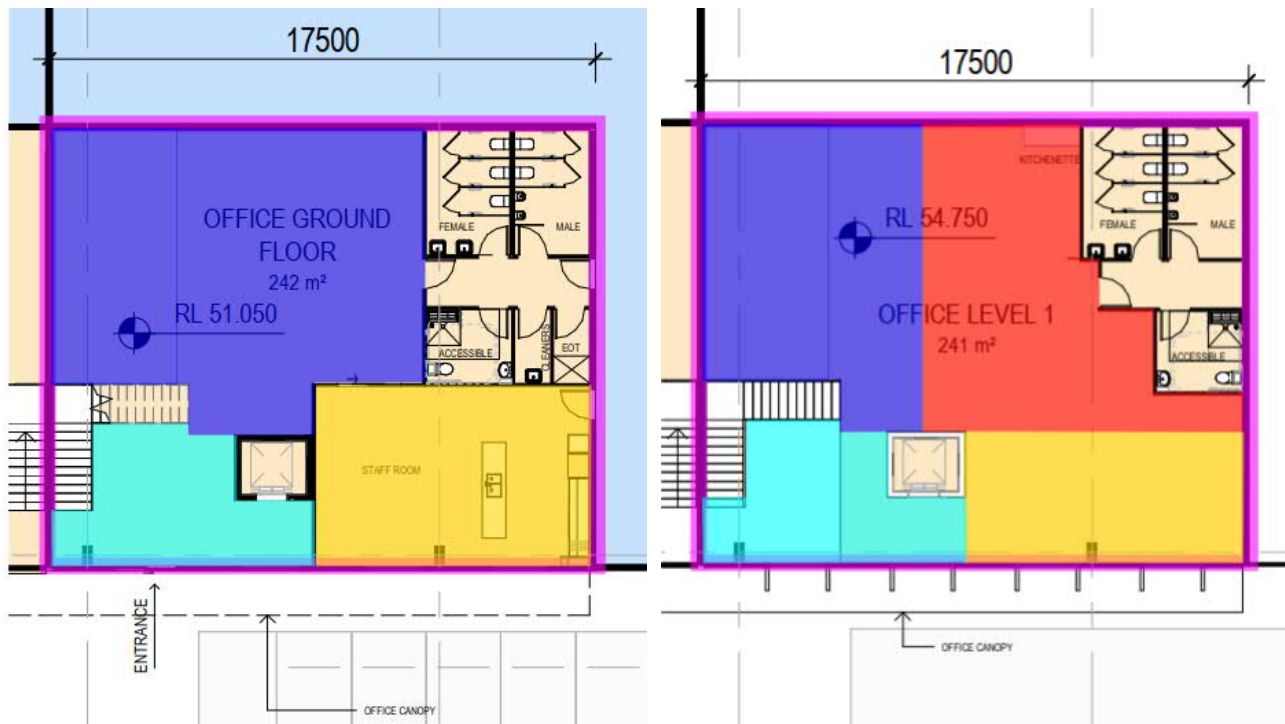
HVAC zones & thermal envelope for 4 McLaren Drive Ground Floor (Left) and First Floor (Right)
